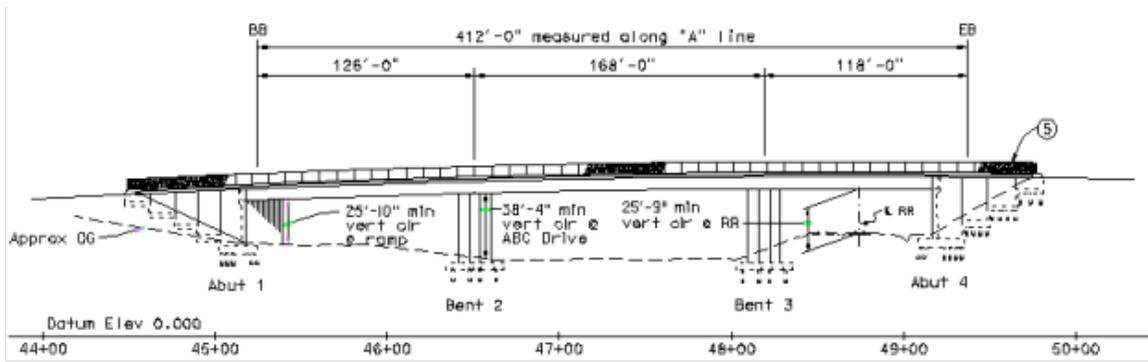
General Plan (Bridge Design Academy Prototype Bridge)
